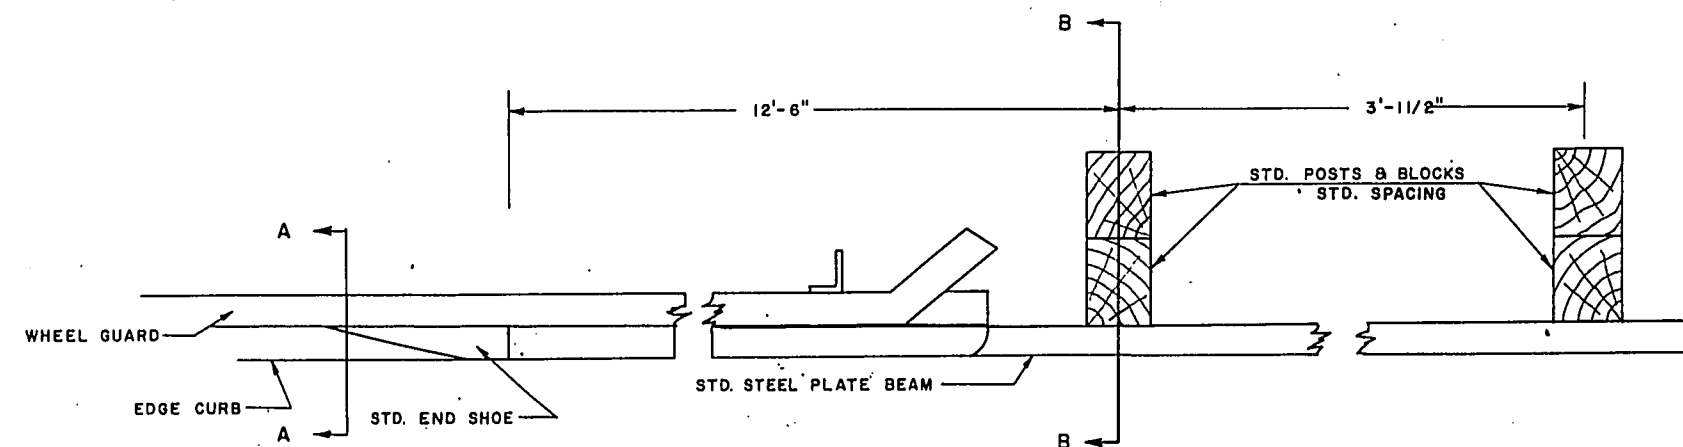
### DETAIL AT STRUCTURES WHERE BRIDGE DECKS ARE TO HAVE 1 1/2" OVERLAY IN FUTURE
